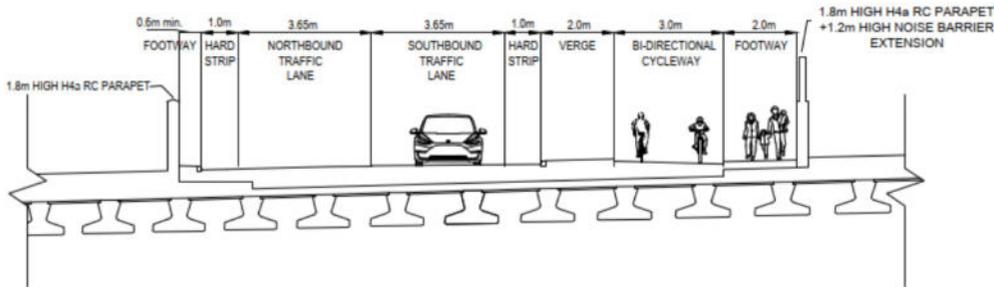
Typical highway cross sections over Appleford Siding Bridge
